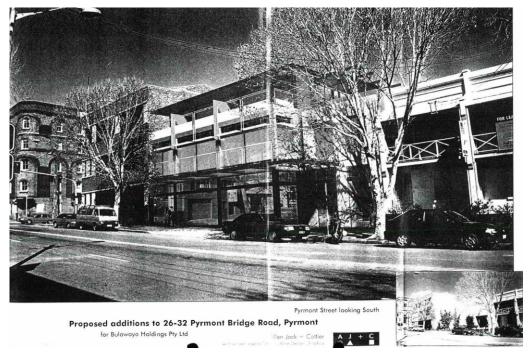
1999 – Render of the proposed new development, by Allen Jack + Cottier for Bulawayo Holdings, showing the Pyrmont Street frontage (Source: City of Sydney Archives, D1999/00812, 'Development Applications/26-32/Pyrmont Bridge Road/Pyrmont/Alterations & Additions to Existing Building – Bulawayo Holdings Pty Ltd – 14 10 99 - \$5000000')
